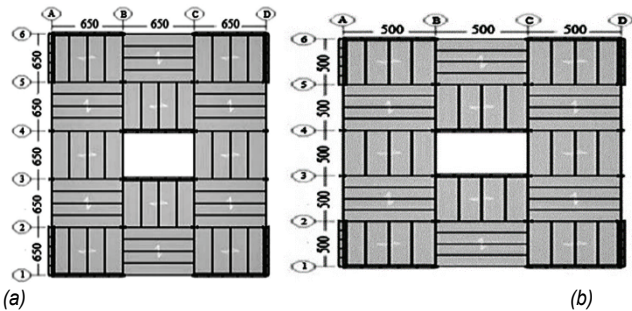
Building plan: (a) with spans 6.5m, (b) with spans 5m
